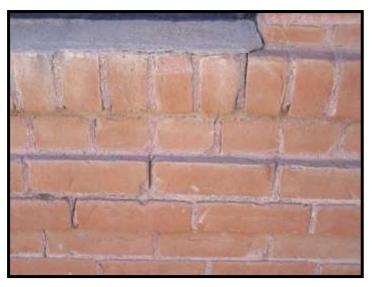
Crack at sill and below, south end of sill, northernmost window in Hall.
